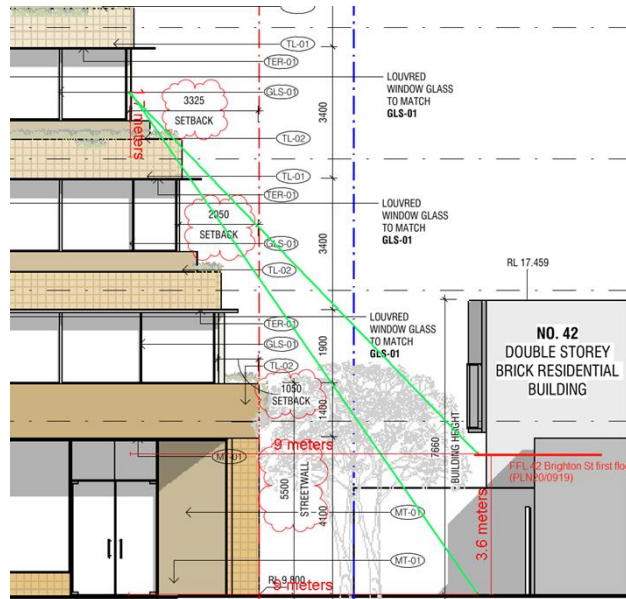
Mark-up of south elevation showing Level 3 views (in green) to SPOS blocked by lower planter box
